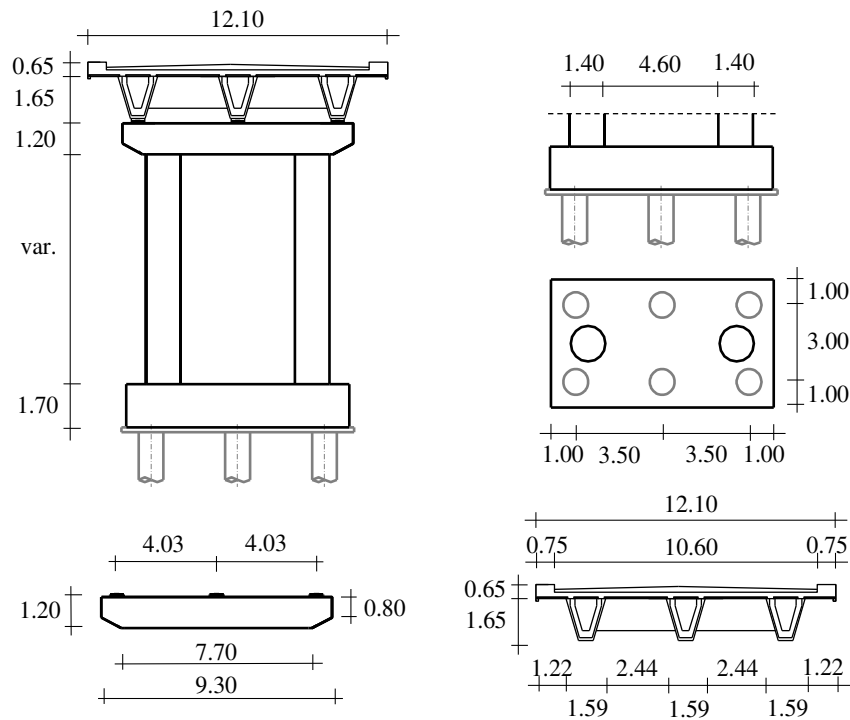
Dimensions of the viaduct cross section, including foundations
